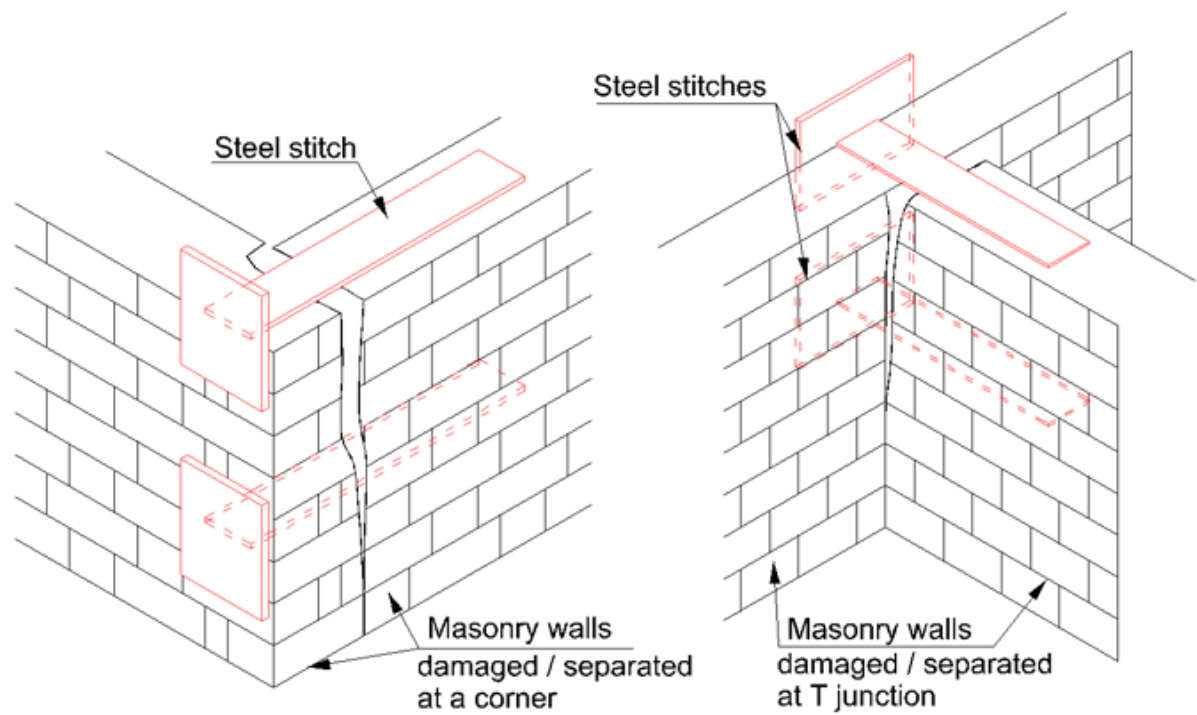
Strengthening of corners and T junctions of masonry walls using steel[51] stitching
